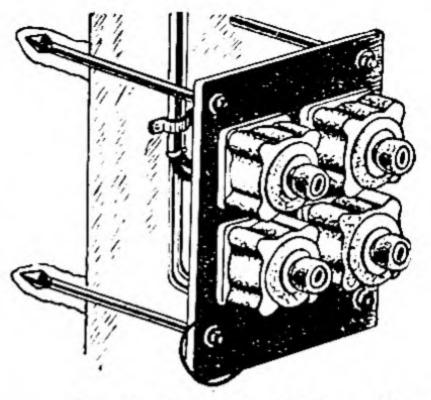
Grade IIP (PR) rubbercovered wire run down to a fuseboard in steel conduit pipe.
